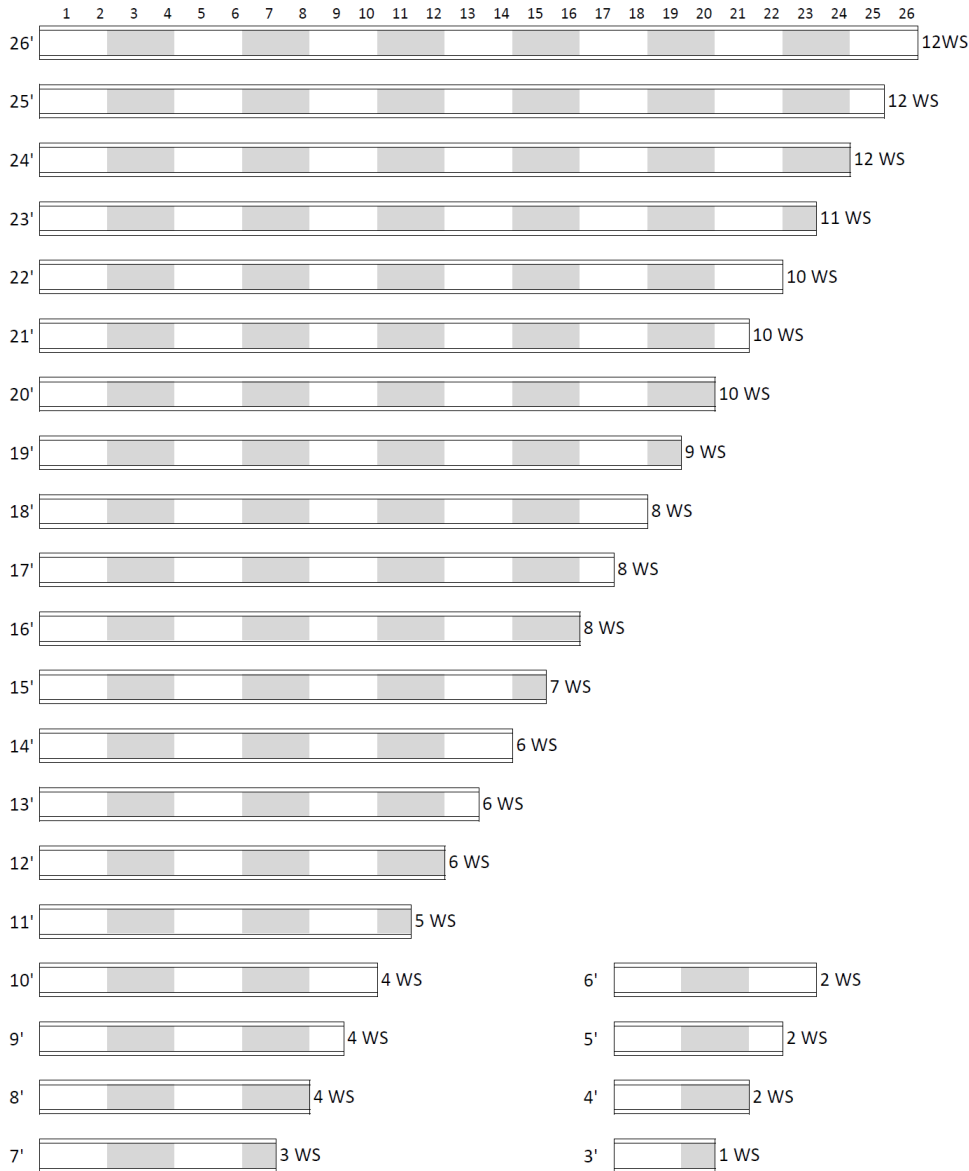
FRI Assemblies - 15/32 in. WEBshield®
